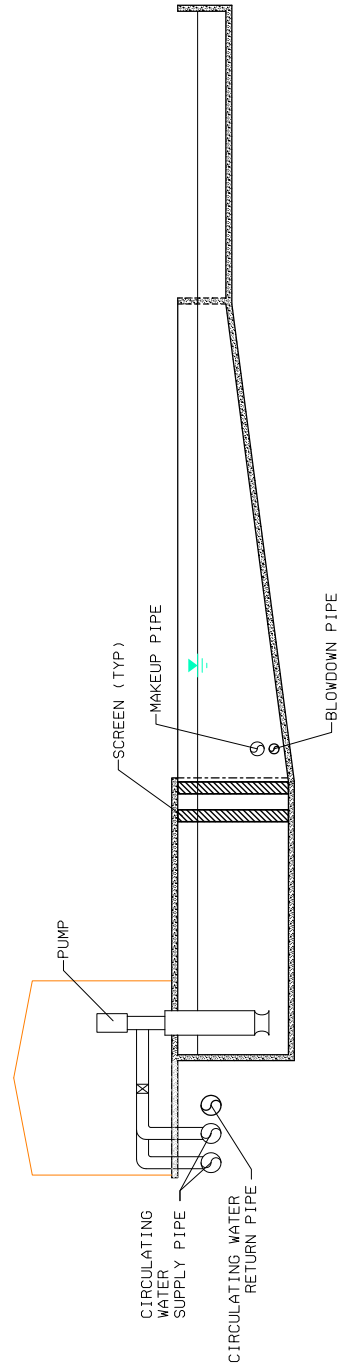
{Circulating Water System P &amp; ID Cooling Towers}
